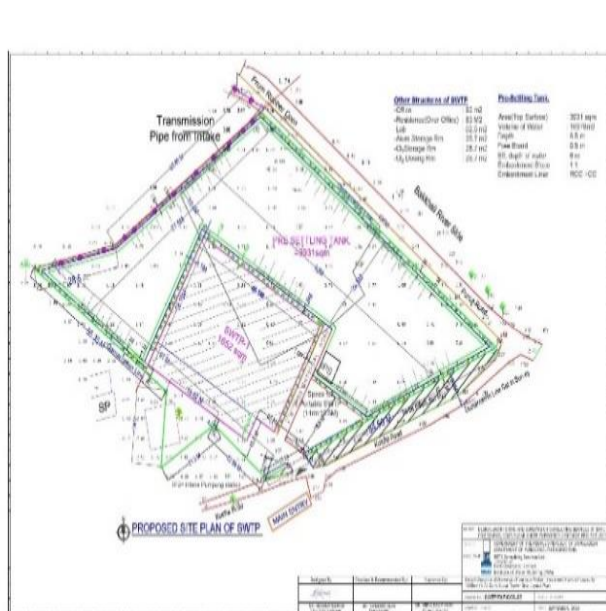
Site Plan for Surface Water Treatment Plan (SWTP) at Bakkhali, Jhilongija, Cox's Bazar
